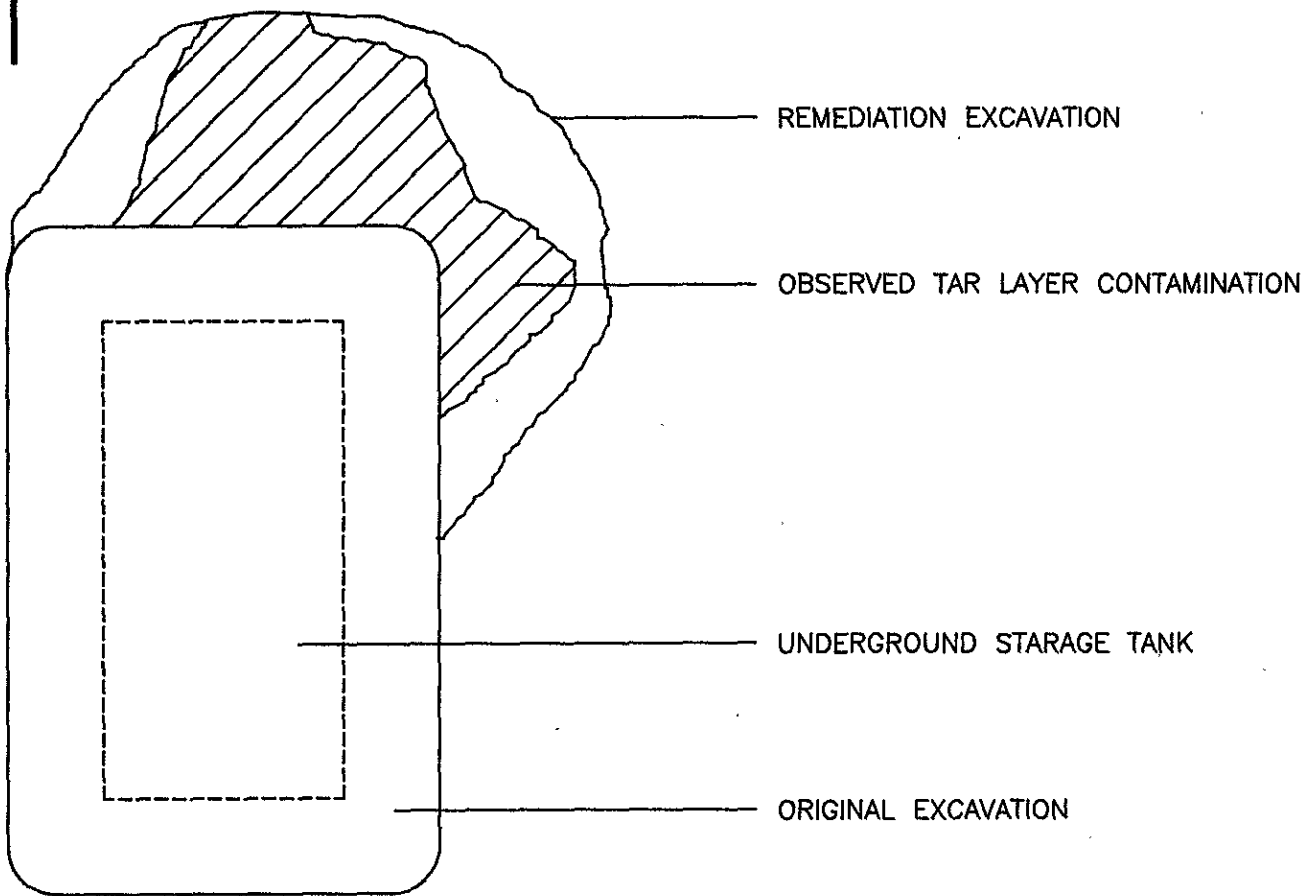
SITE PLAN SHOWING FORMER 1,1,1-TCA TANK AND SOIL SAMPLE LOCATIONS
